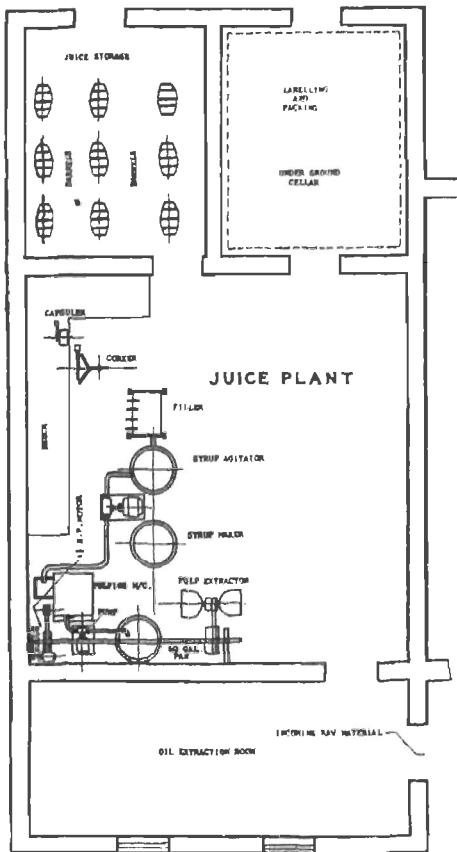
LAYOUT PLAN OF A JUICE PLANT
